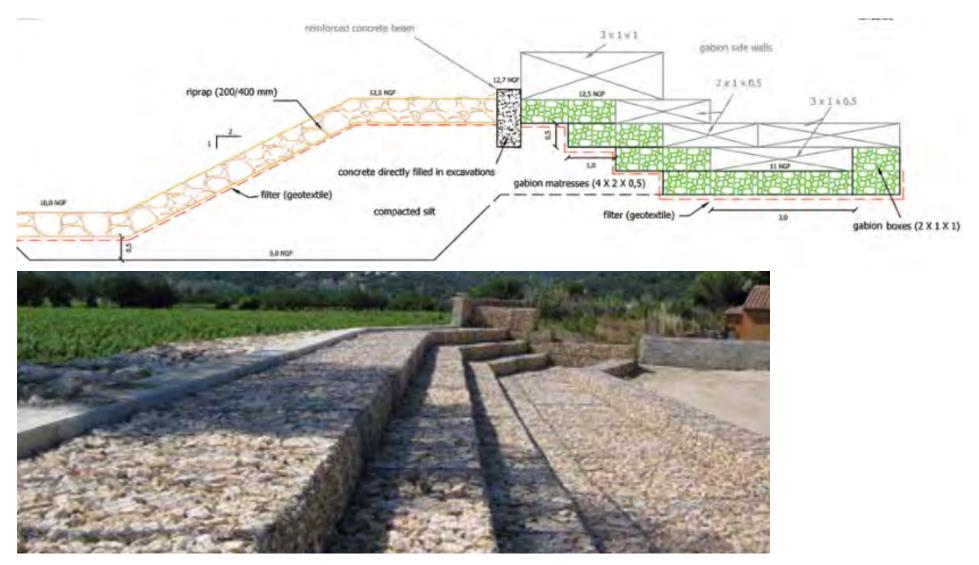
Example of a Stepped Structure using gabions (from CIRIA et al., 2013; The International Levee Handbook). Stepped structures like this are also commonly formed with traditional concrete or roller compacted concrete for different applications where space is limited, and steeper slopes are required for water management.
